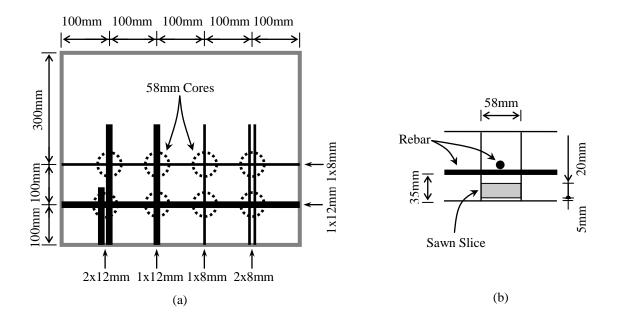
Reinforcement encasement test (a) plan view (b) core side view.
